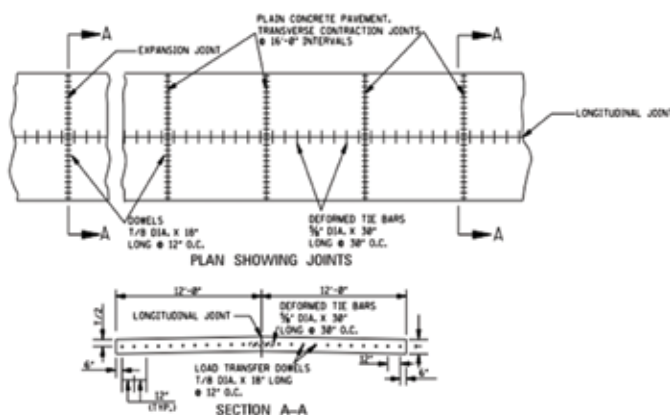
A plan view of a pavement with transverse contraction joints and a cross section of a transverse joint detail
